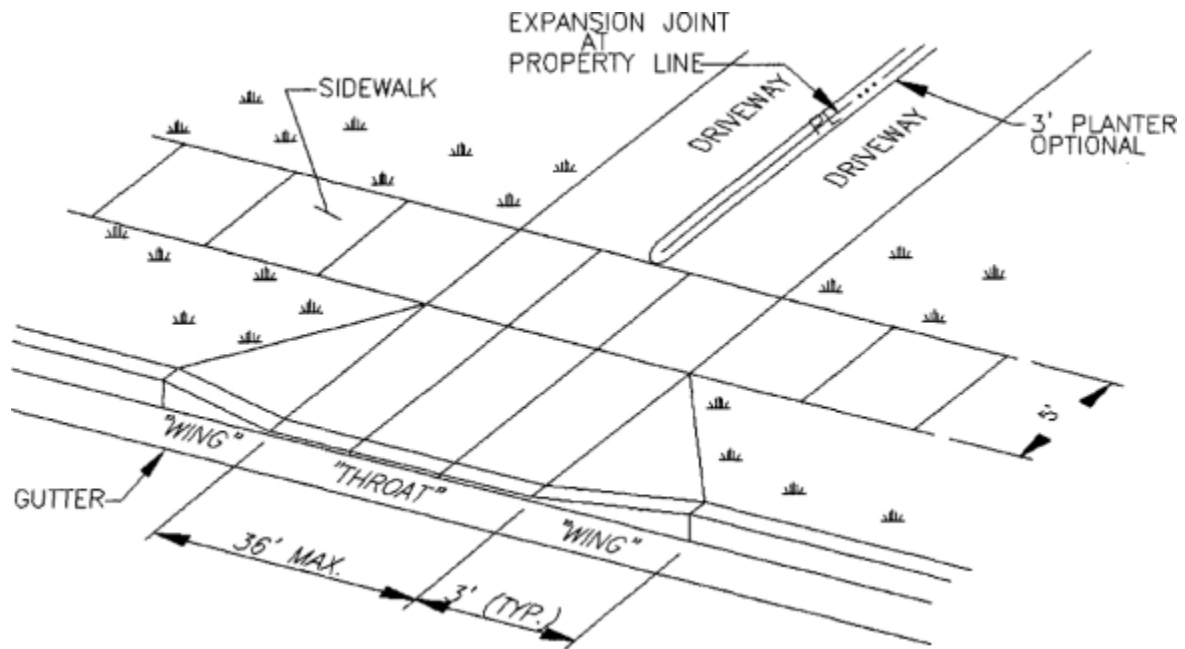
Narrow Lot Shared Driveway Detail with Detached Sidewalk
